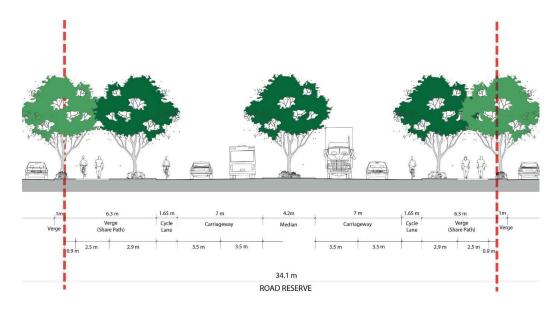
Sub-Arterial Road Cross Section (On-Road Cycle Lane)
